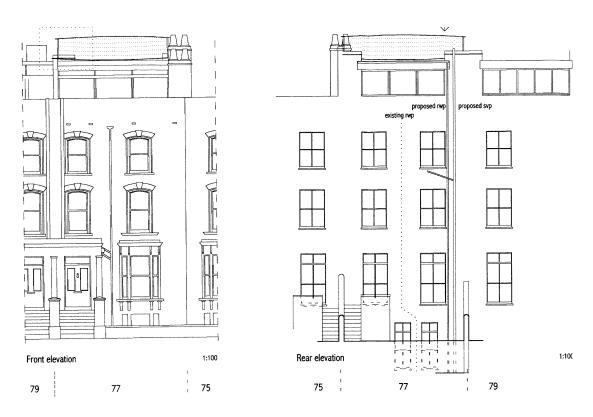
Approved elevations of 77 Bartholomew Road Application PEX0100519
